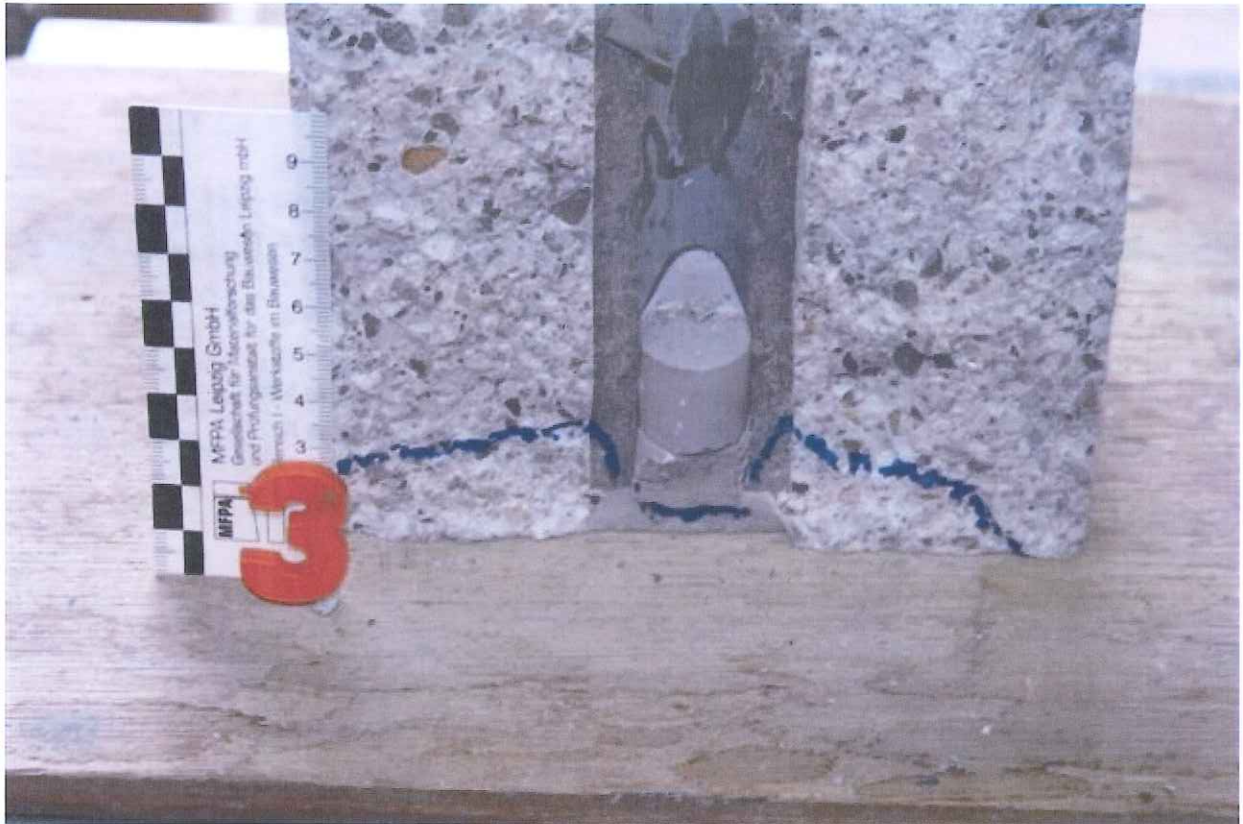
Series B 'FRANK fibre-reinforced concrete distance tubes – MR 22 with one fibre-reinforced concrete plug St220020 and one fibre-reinforced concrete sealing cone FBVKZ22, sample 3
